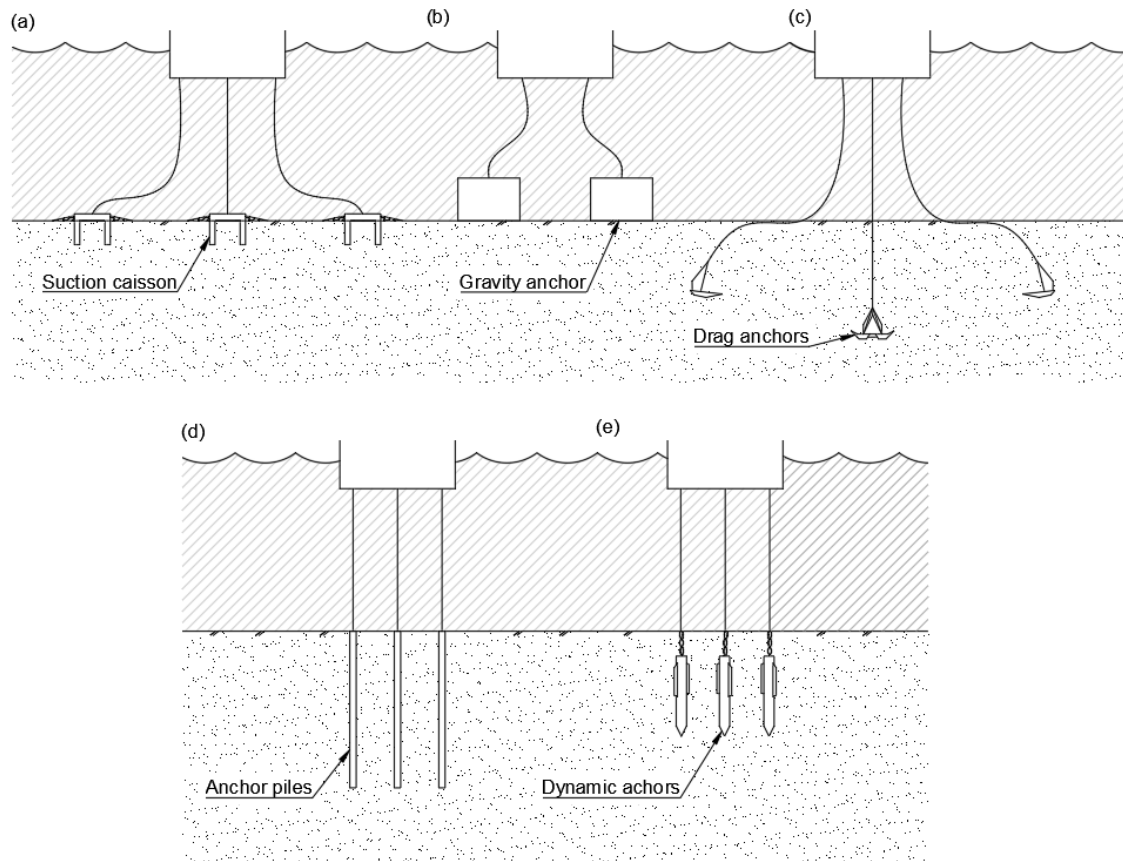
Foundation types for floating structures: (a) suction caissons, (b) gravity anchors, (c) drag anchors, (d) anchor piles, and (e) dynamic anchors.
